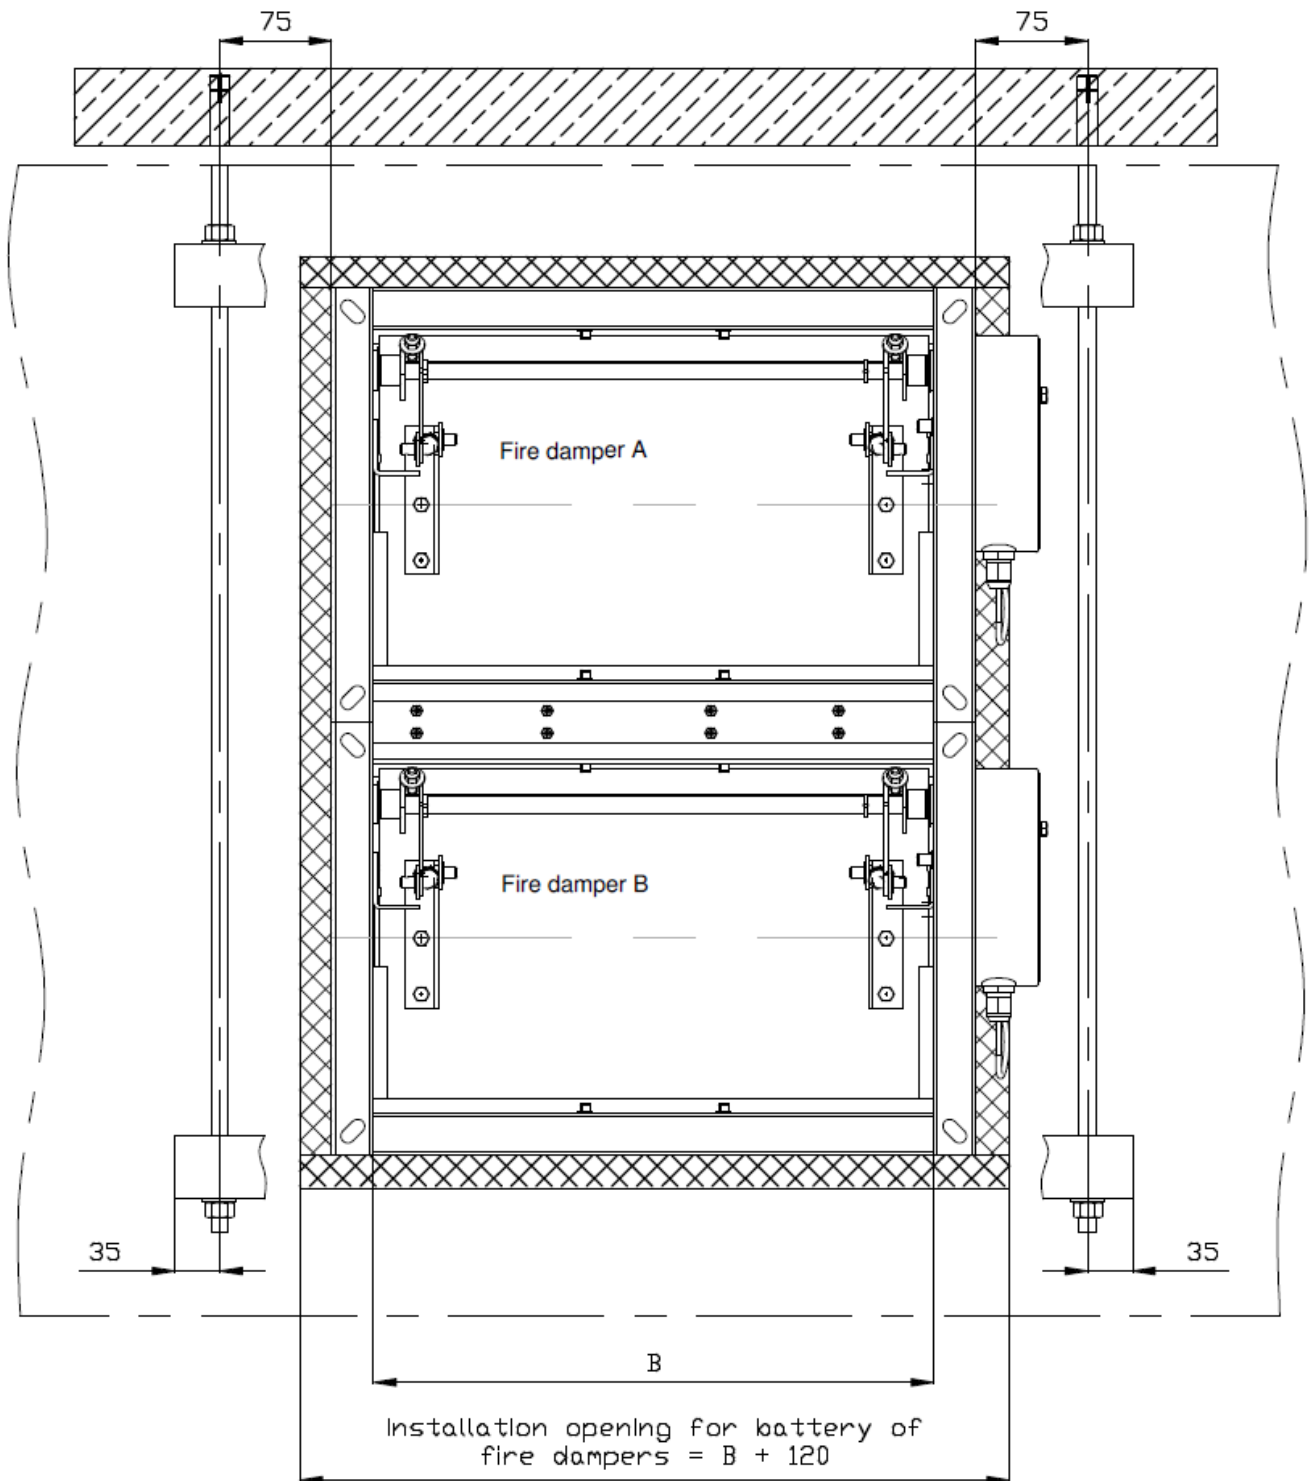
Installation of a battery consisting of two fire dampers KWP in vertical arrangement in rigid compartment - front view.
